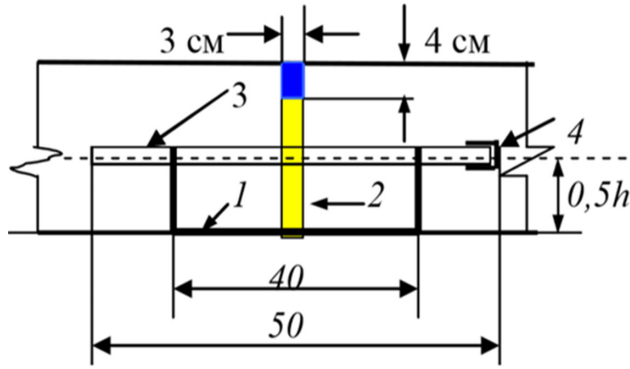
Expansion joint design (1 – bond transfer steel supporting rack; 2 – joint filler wood board; 3 – bond transfer steel; 4 – plastic cap)
